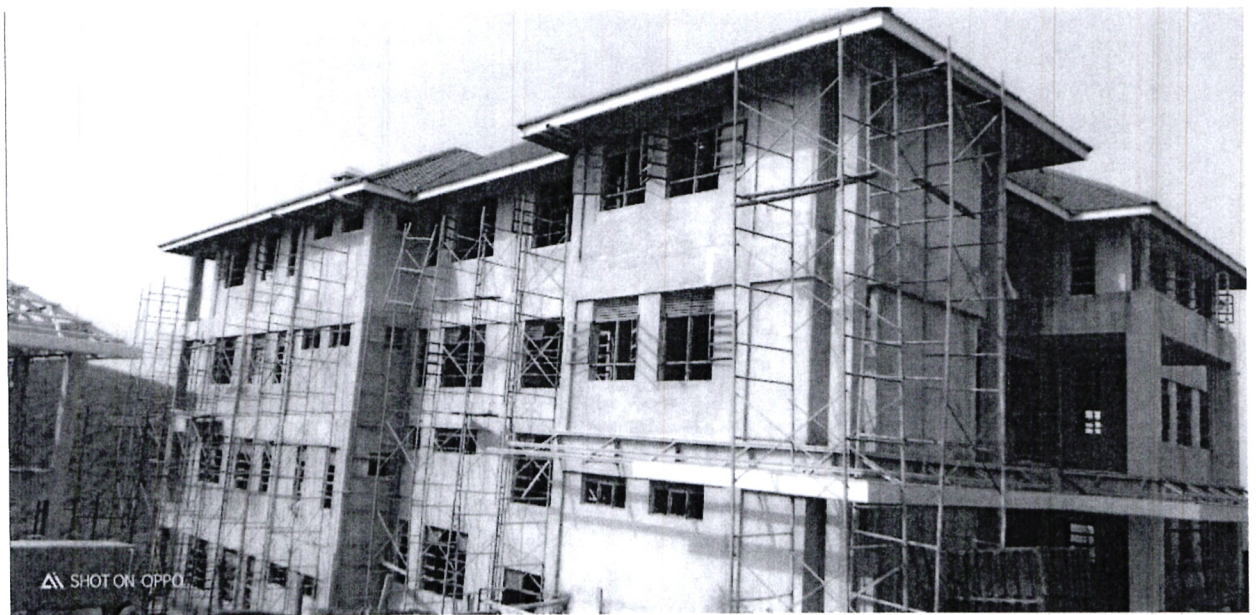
Work in progress at CWSK Murang'a Foster Care (Floor Elevation)
